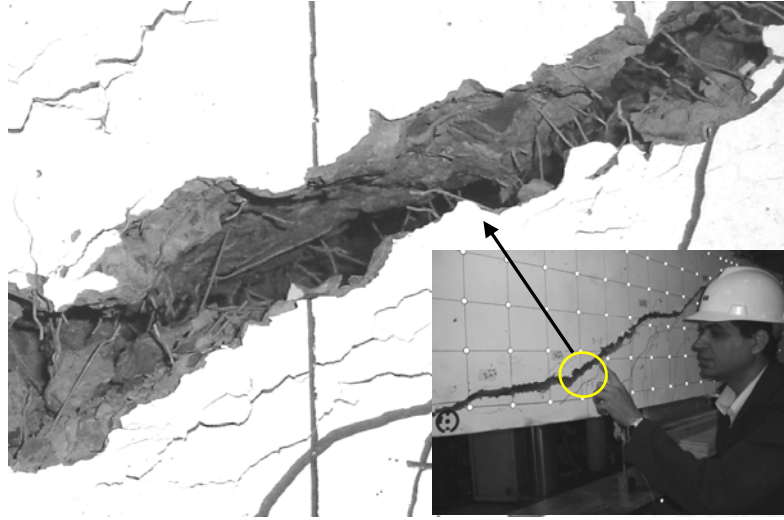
Critical shear crack after failure for a typical lightweight SFRC specimen.
